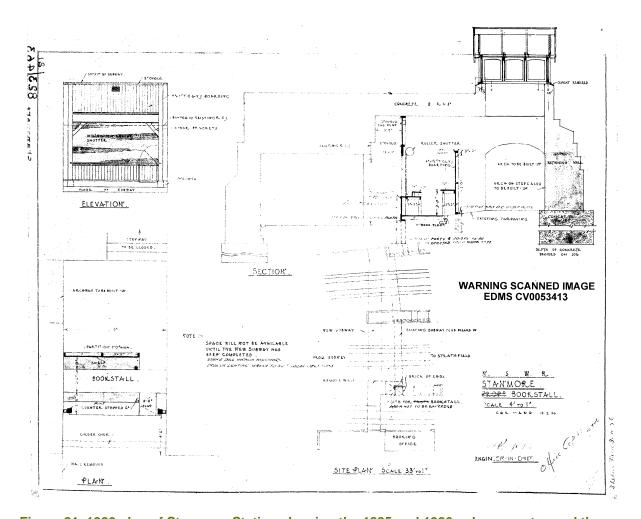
1926 plan of Stanmore Station showing the 1885 and 1926 subway routes and the bookstall, now infilled, with a lantern above similar in design to the lantern above the Platform 1/2 staircase (Source: Sydney Trains Archive, 0070429 00C)
